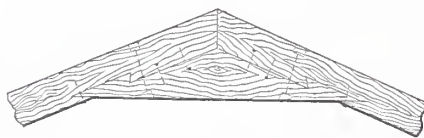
Form of Construction, Using a Piece of 2-Inch Plank.
